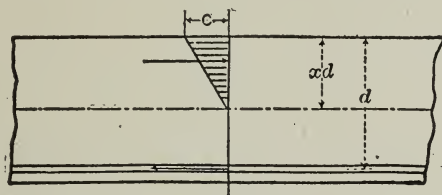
Stress Diagram. Reinforced Concrete Beam.
